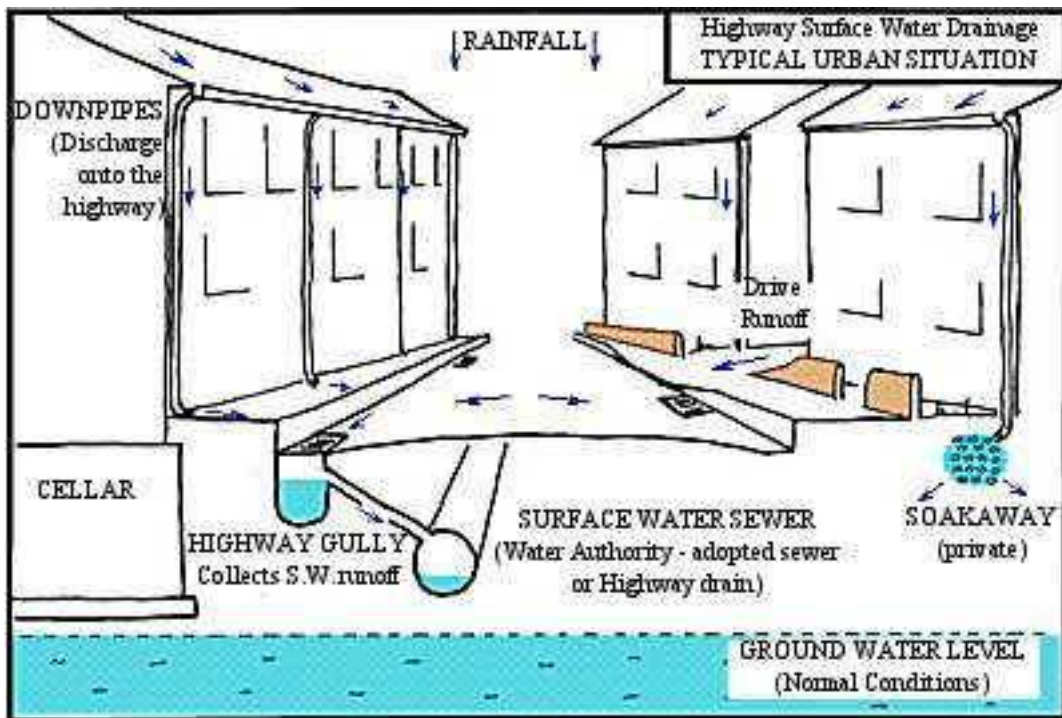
Stormwater Drainage Responsibilities<sup>3</sup>
